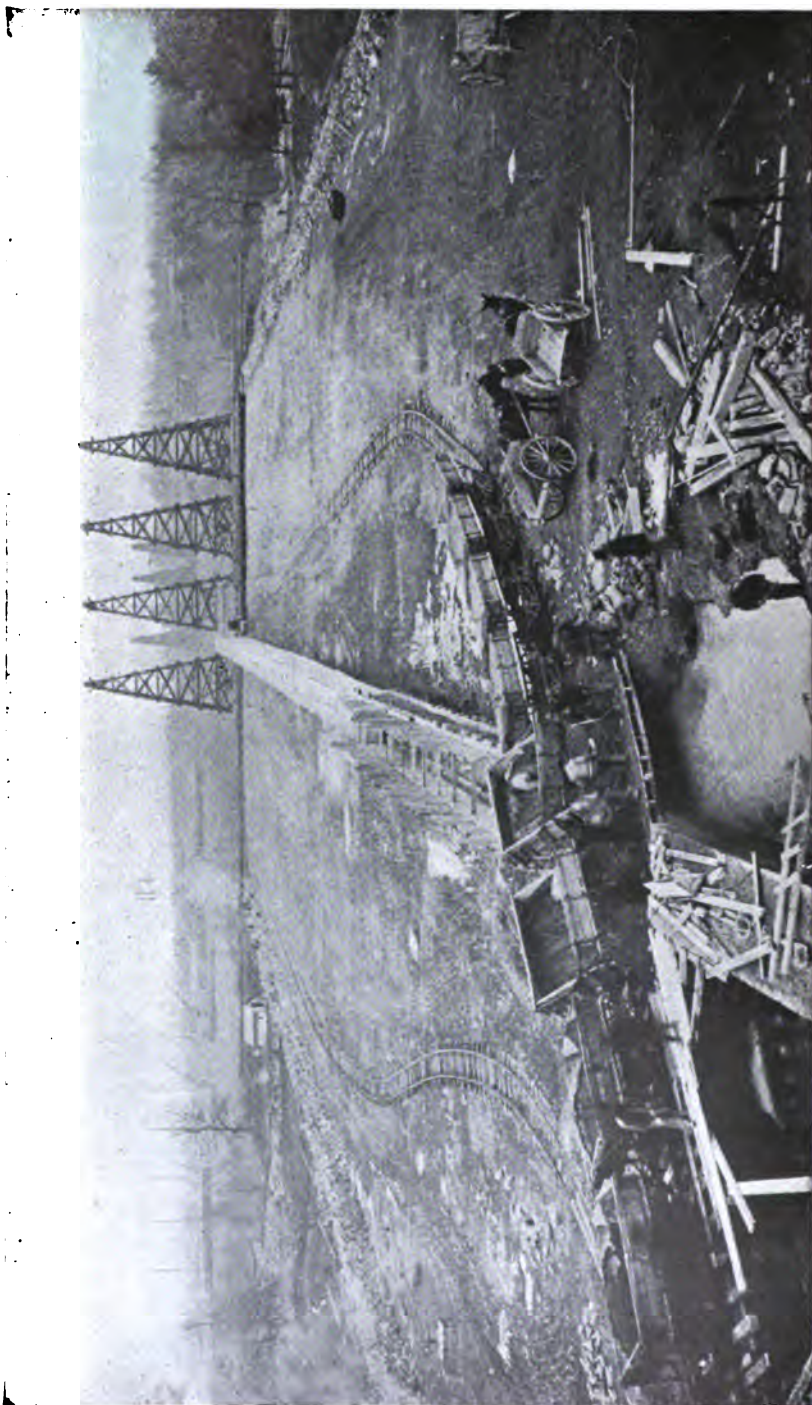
Olive Bridge Dam, South Wing. Building of Impervious Embankment. Glacial "Hard-pan" Dumped from Trains and Rolled to 4-inch Layer Upstream Side and 6-inch Layer Downstream. Constructed to Lines Shown on Plate 32. Boulders in Fill Used for Riprapped Slope.
